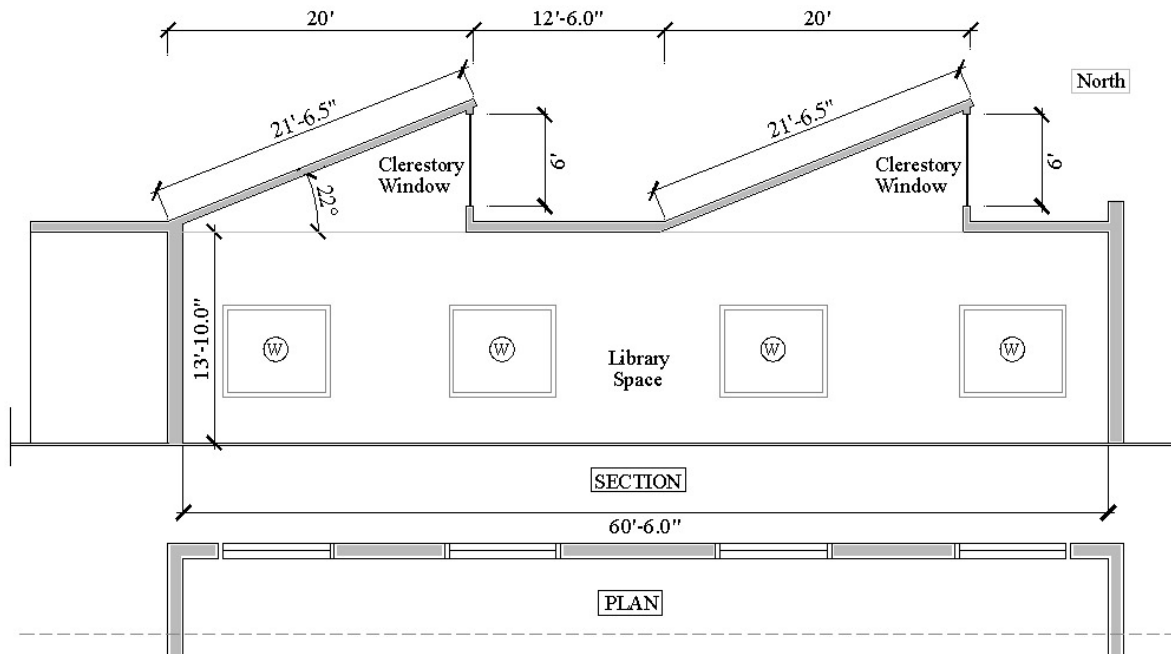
Section of the clerestory windows in the library space. A 6 ft glazing has been shown as in Figure 3.9. The two clerestory windows are arranged facing north.
